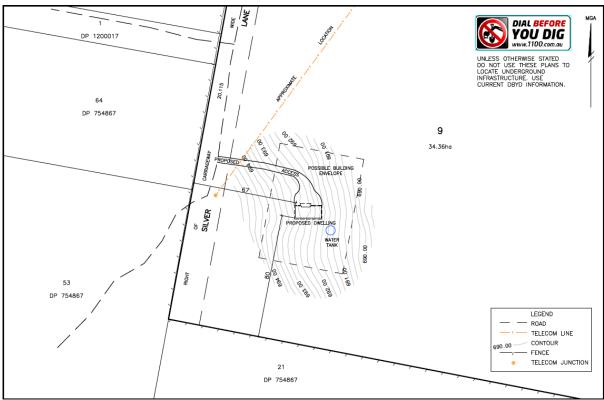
Survey Plan showing proposed dwelling location and accessway
